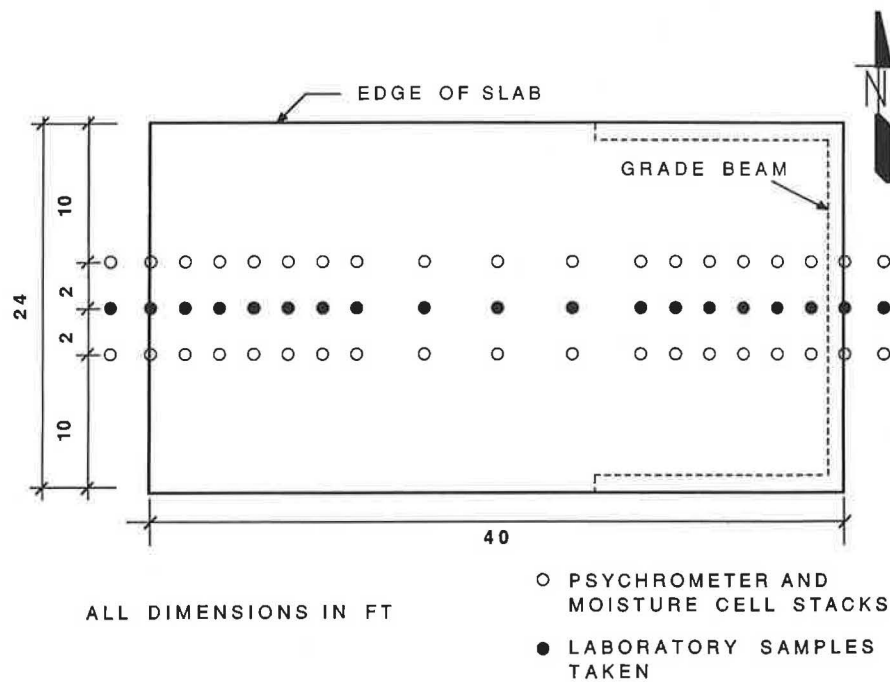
Test site layout showing dimensions of the test slab model, instrumentation stacks, and sampling locations.
